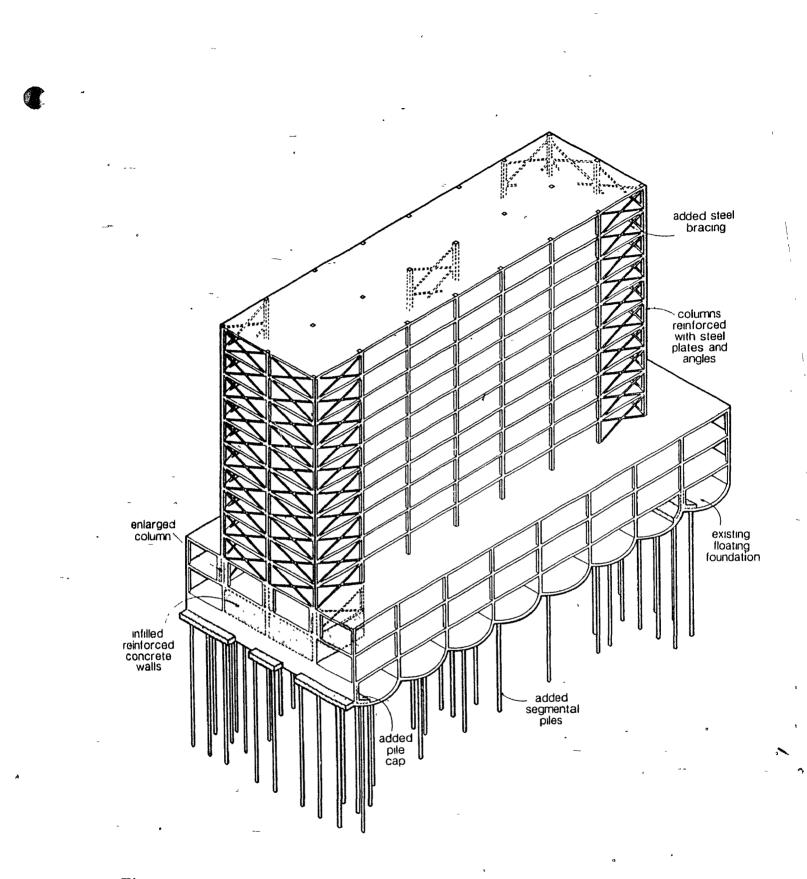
Strengthening of Eleven-Storey Office Building at 243 Paseo de la Reforma in Mexico City.
